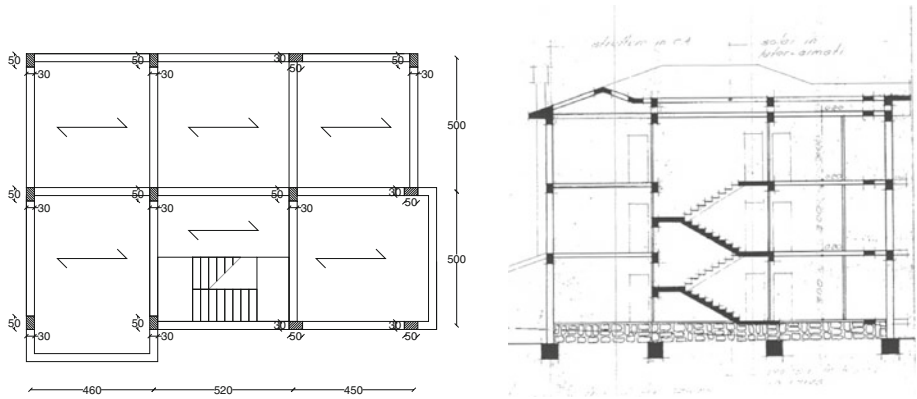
In plan (units are cm) and transversal sections of the studied building
